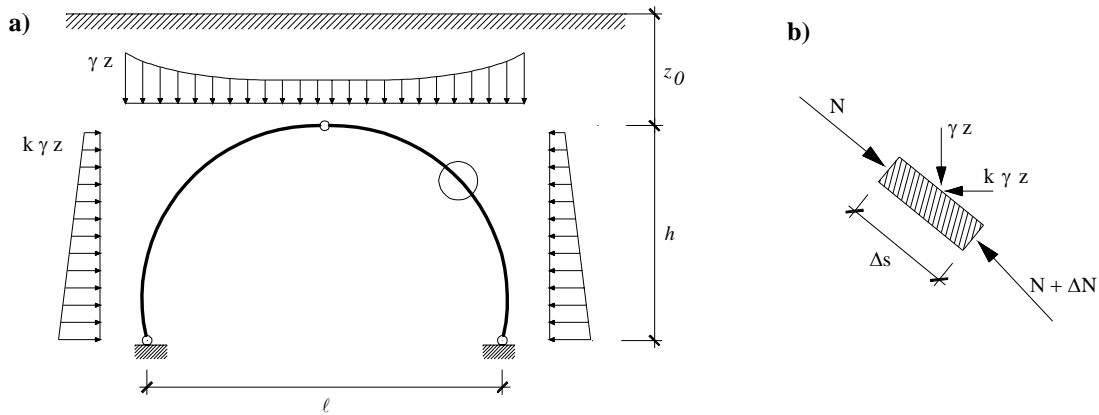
a) Loads acting on the embedded arch. b) Forces acting in an infinitesimal arch element.
